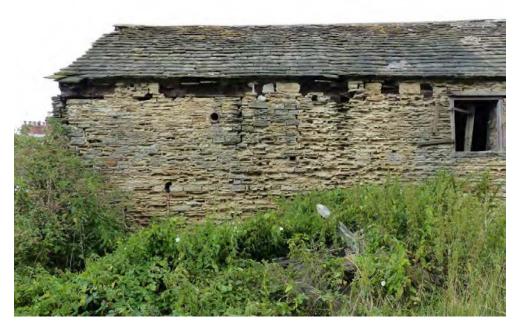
Bay 5 looking west. Wall plate exposed behind stonework
